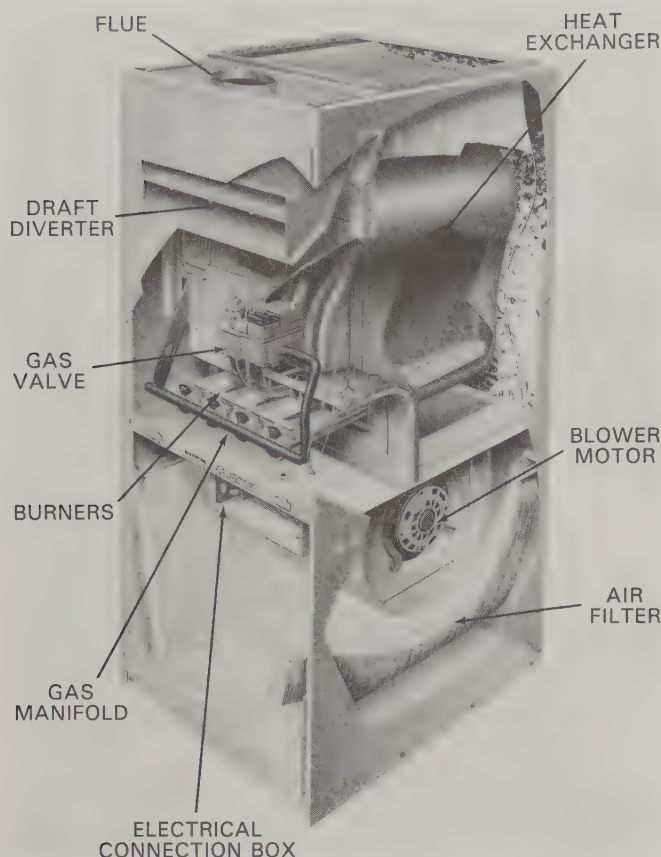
A cutaway view of a typical gas-fueled forced-air furnace. With the addition of an evaporator coil and a separate condensing unit, the same equipment can also be used for cooling. (Lennox)
